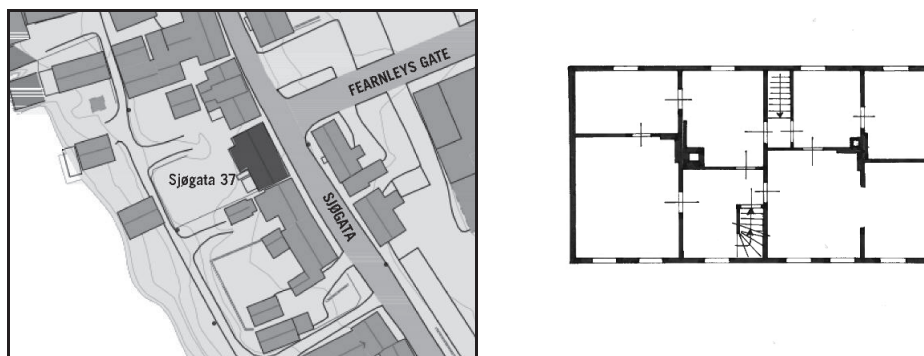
Sjøgata 37 site plan (left) and floor plan (right) (GIS; August Schmidt 2010)
